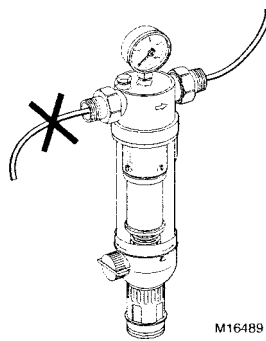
Ensure the inlet pipe is not downsized. Do not use 1/4 or 3/8 inch tubing on 1/2 or 3/4 inch models.
